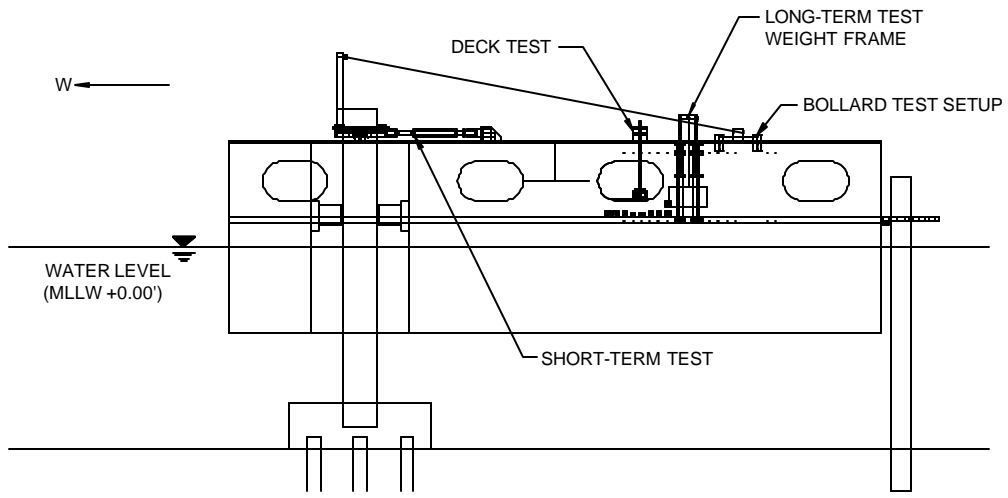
MHP Test-Bed Structure - Elevation View
